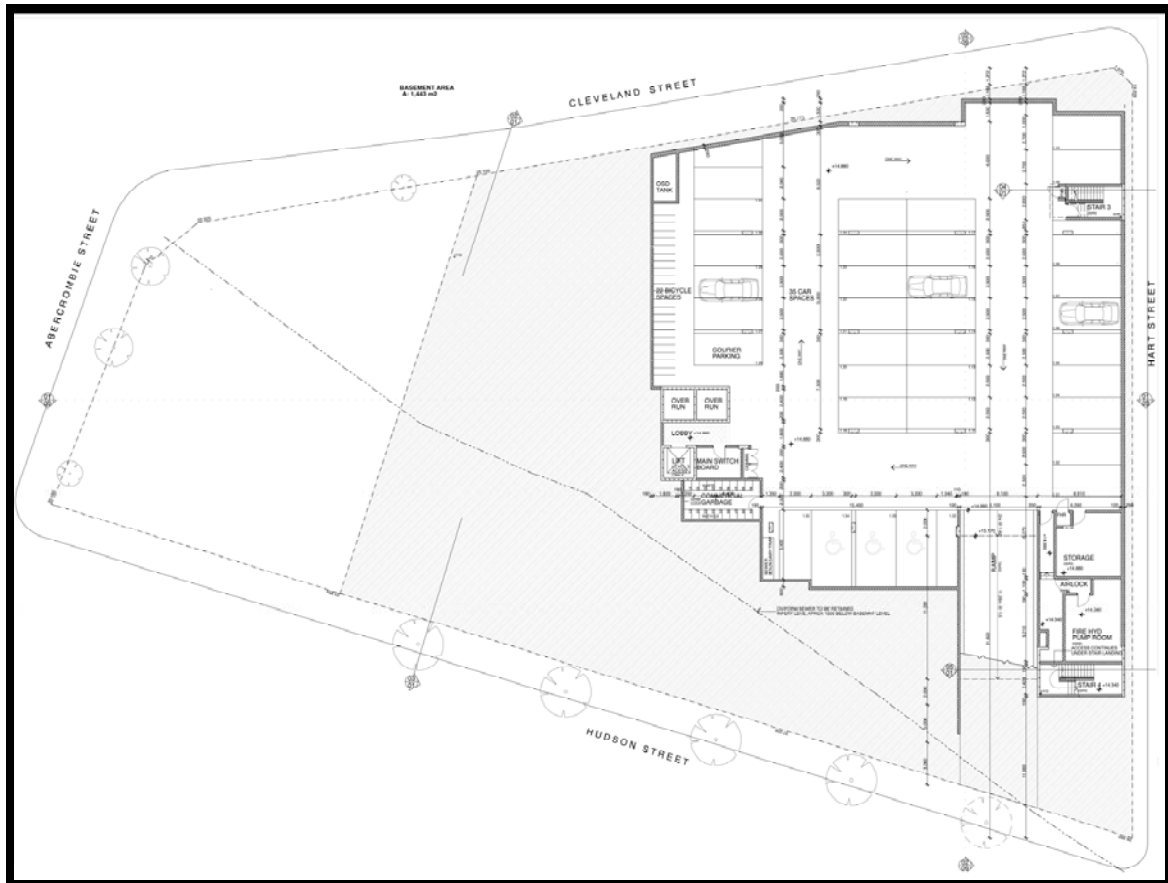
Basement plan of proposed development (not to scale). (Source: Fortey + Grant Architecture, 2010)
